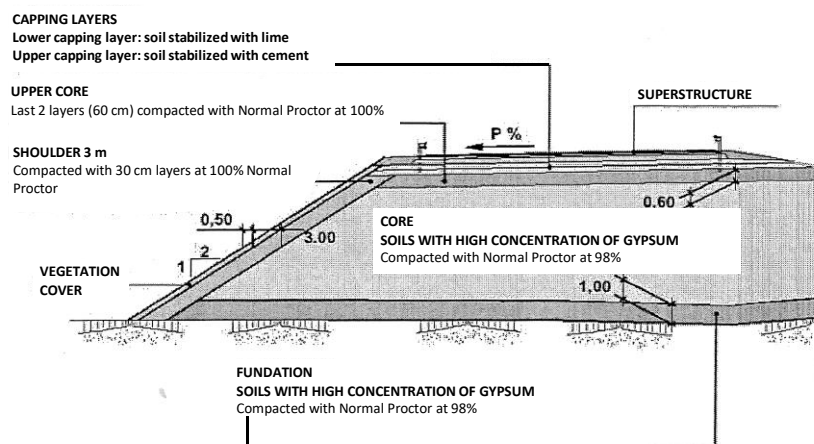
Example of an embankment section constructed with gypsum (from Soriano, 2006)
